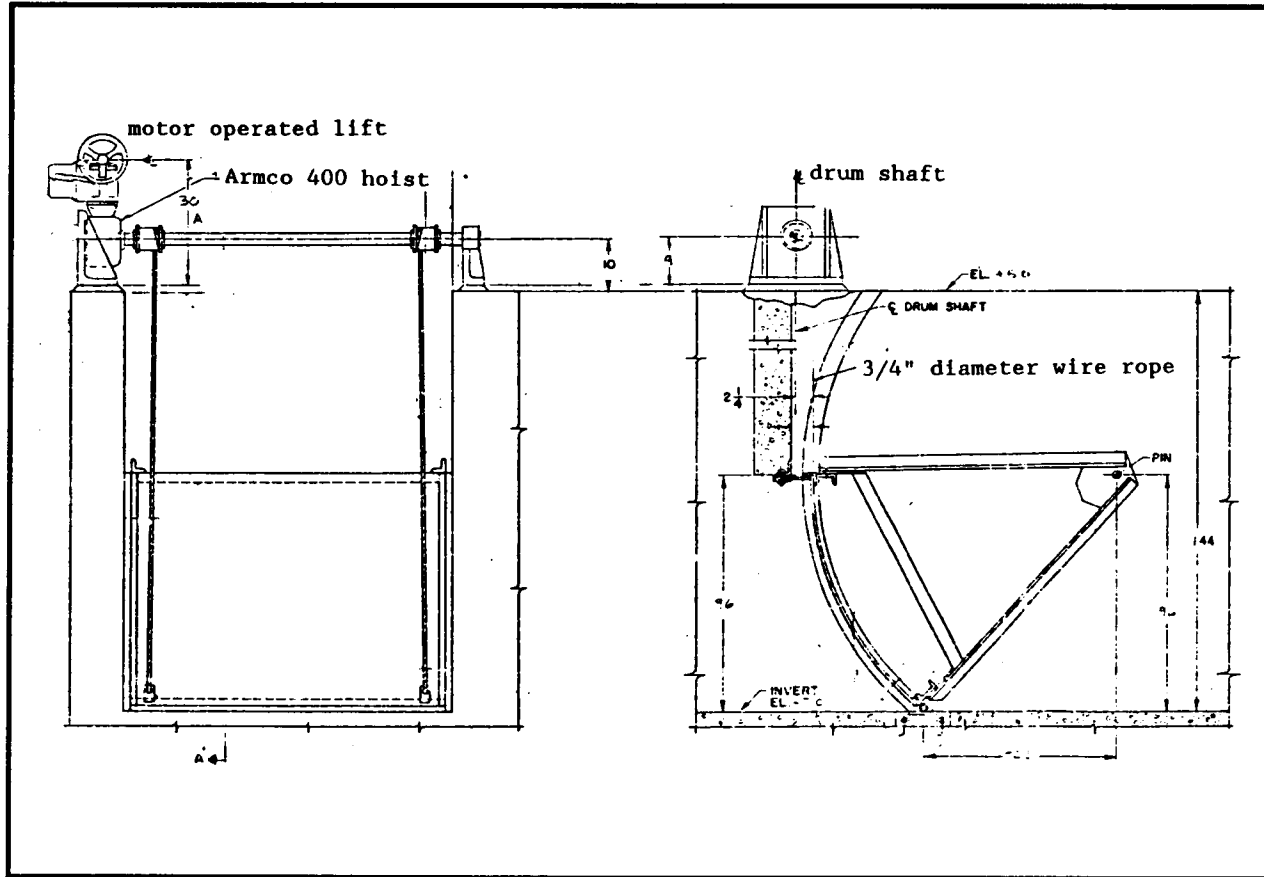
Detail of Sabine Refuge cement (concrete) tainter gate: (ARMCO Steel Corp. 1980).
